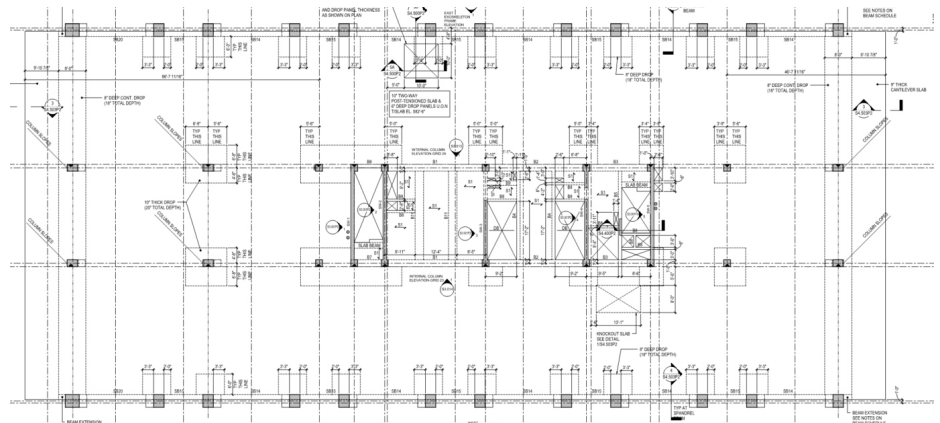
Typical floor plan. Image Credit: Thornton Tomasetti
